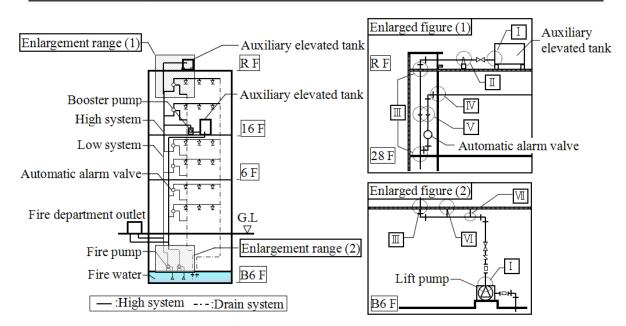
Model outline of vertical sprinkler piping in evaluation building
